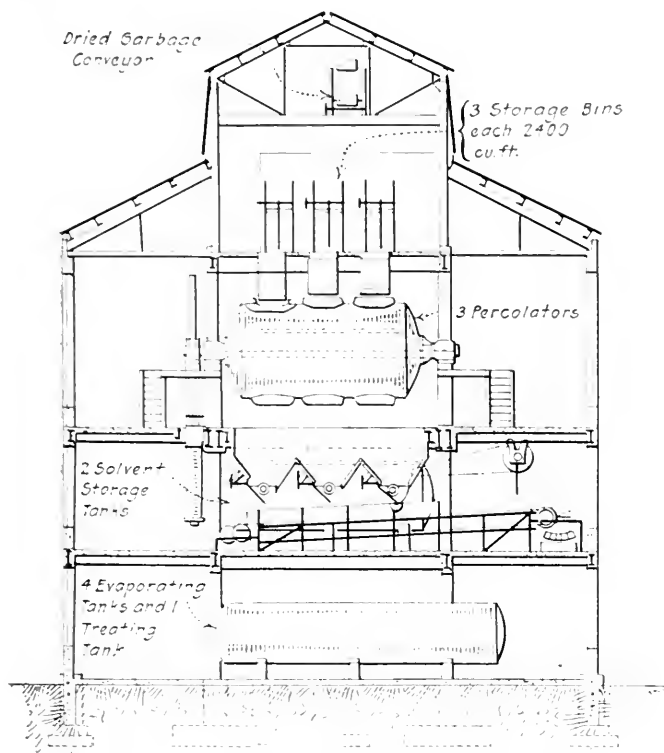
CROSS-SECTION OF EXTRACTOR BUILDING
